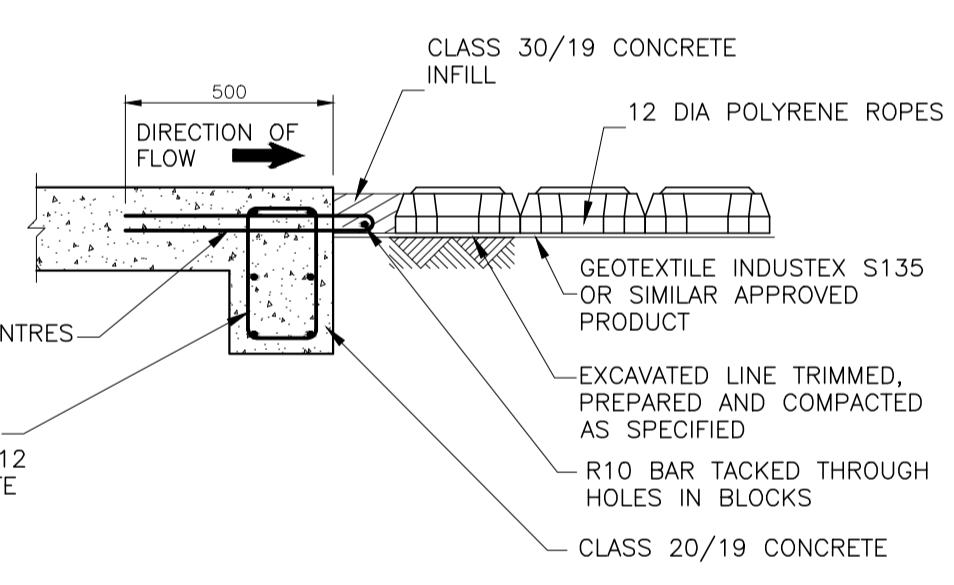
FOR ANCHORING ALONG TOP EDGE OF ARMOFLEX LINING: CONCRETE BEAM AND Y- FENCING STANDARDS
